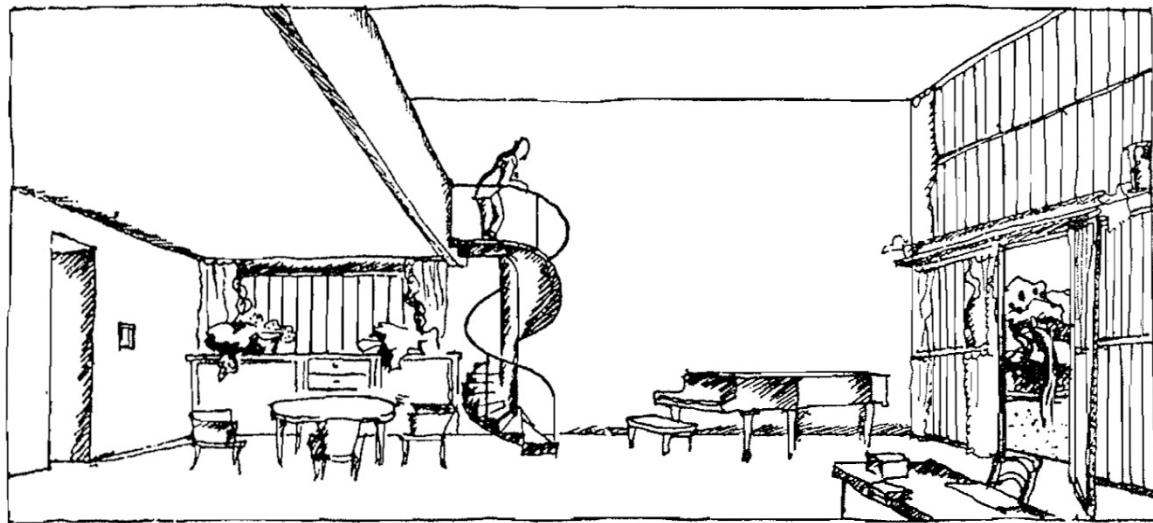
Maison Citrohan I – Interior perspective drawing © Towards New Architecture
